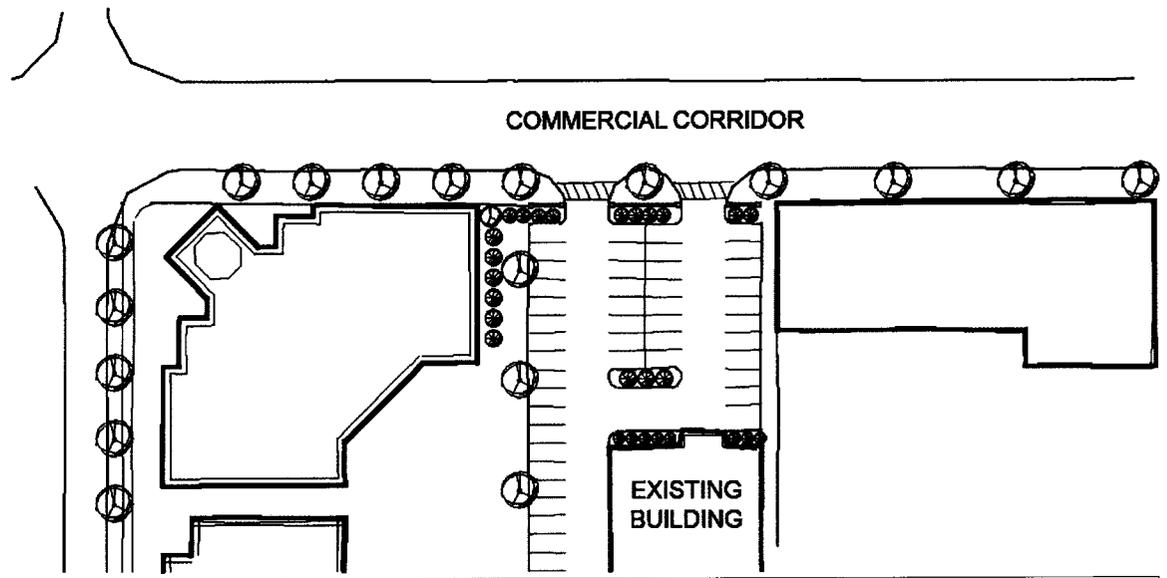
The addition of landscaping and/or a low wall to restore the street setback line where existing buildings are set further back on the lot is encouraged.
